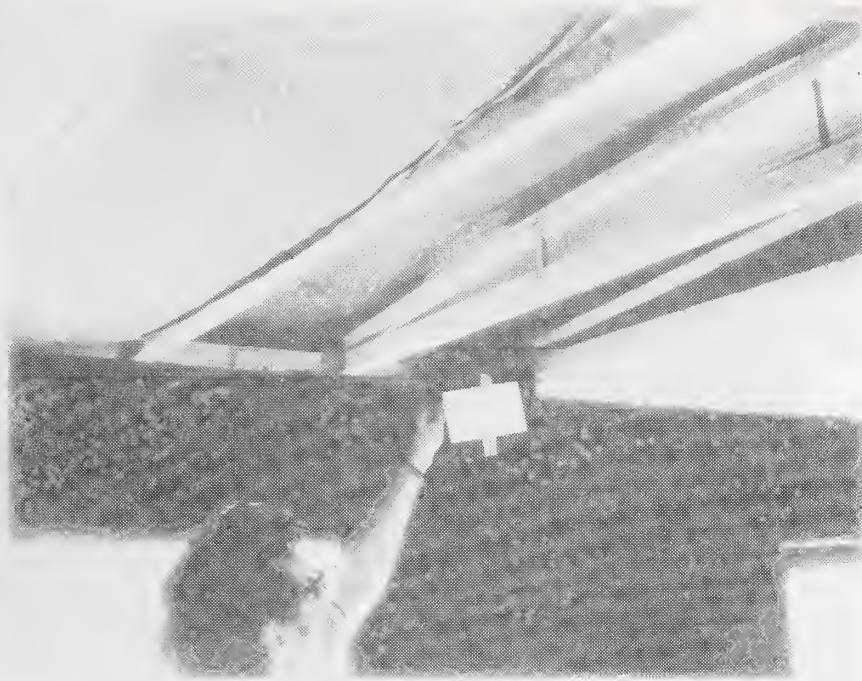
Insulation Missing in Roof System. Note Metal Roofing Loosely Lying on Roof Truss Which Would Likely Result in "Roof Rumble" in Windy Condition
